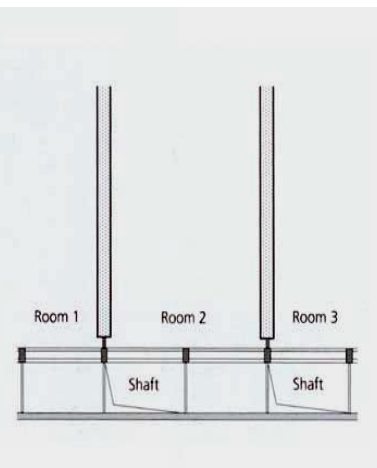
floor plan of a shaft box facade (Oesterle et al, 2001)
